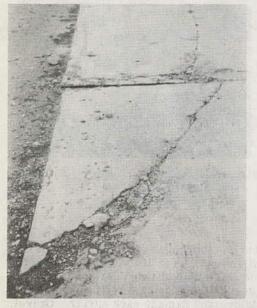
Differential Heaving Diagonal Cracking Parallel to Old Road Fill Crossed at Grade.
